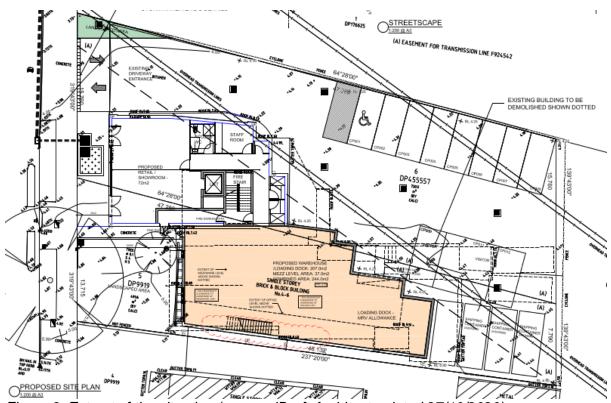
Extract of the site plan (source: iDraft Architects, dated 27/10/2020)
